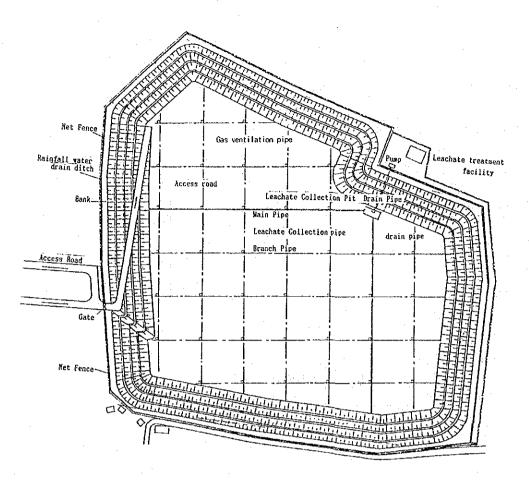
Layout Plan for the Sanitary Landfill in Ram Intra
